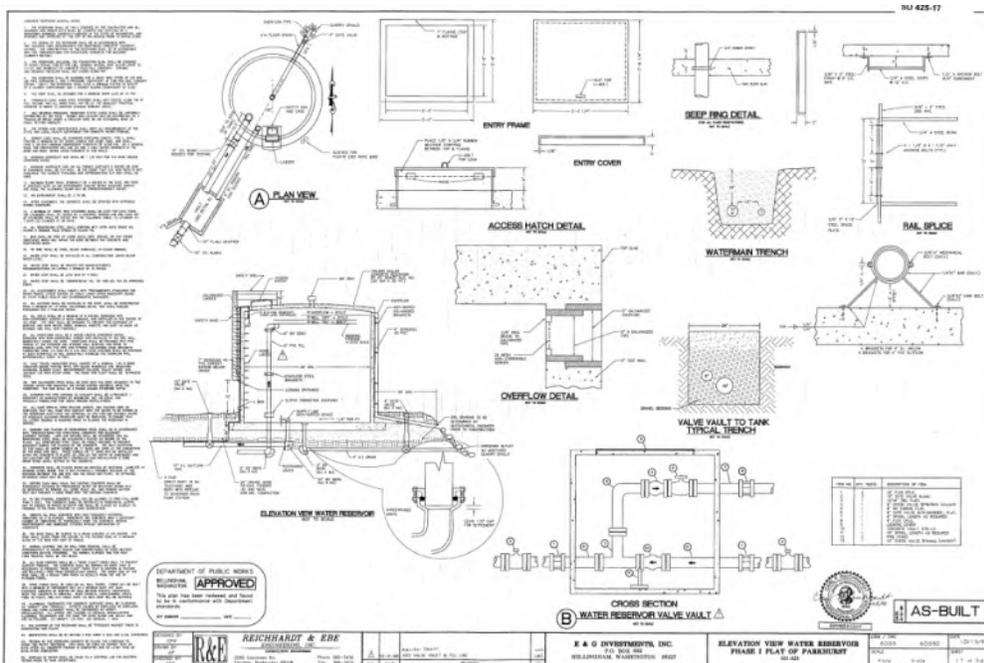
Parkhurst Reservoir – Elevation Drawings by Reichardt & Ebe Engineering, Inc.
